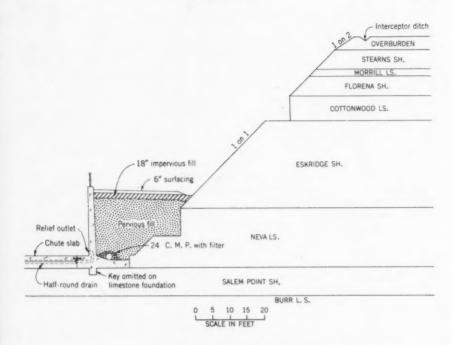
SECTION-SPILLWAY SIDEWALL
